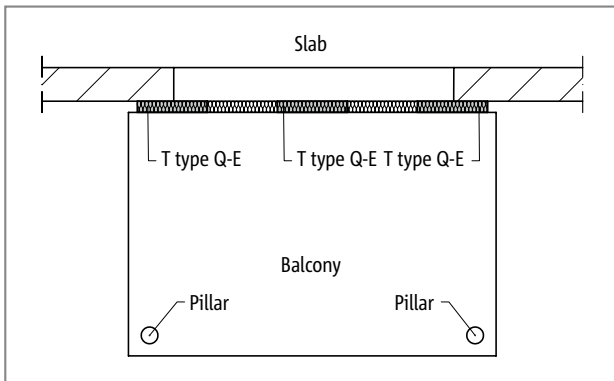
Schöck Isokorb® T type Q-E: Balcony with pillar support
